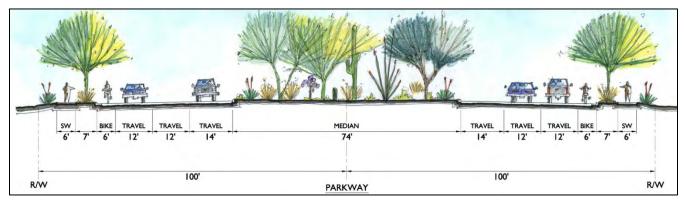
AZ Parkway: 6-lane Urban Typical Section
